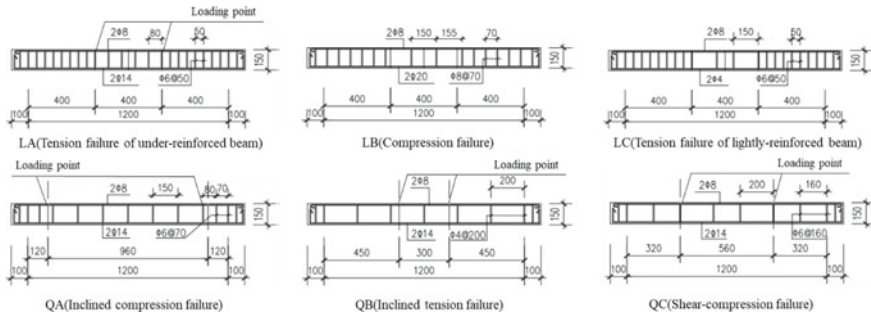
Configuration of longitudinal reinforcements and stirrups in concrete beams (unit in mm)
